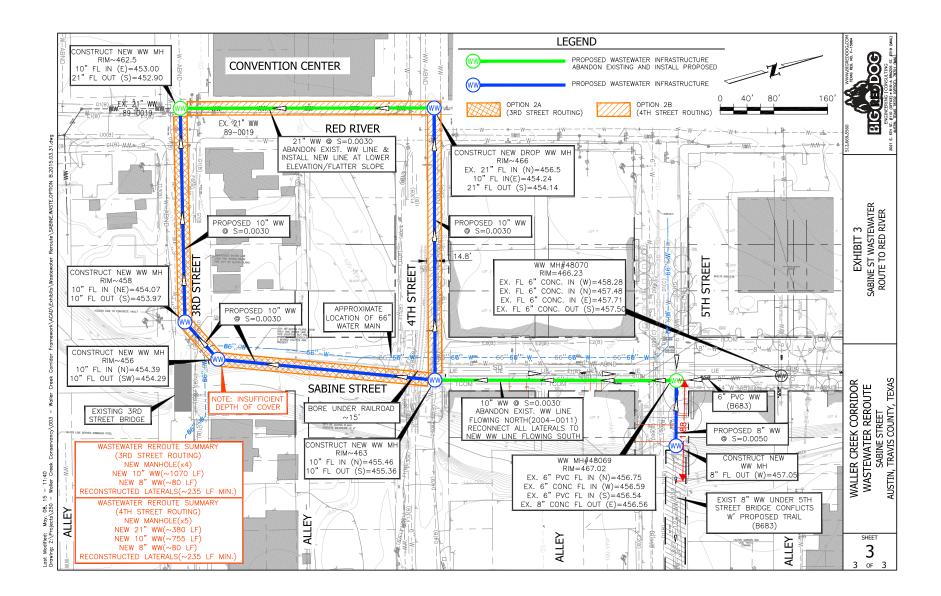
4<sup>th</sup> and 5<sup>th</sup> Street Bridge Cross Sections Exhibit 2: 4<sup>th</sup> Street Bridge Wastewater Reroute Exhibit 3: Sabine and Red River Wastewater Reroute
